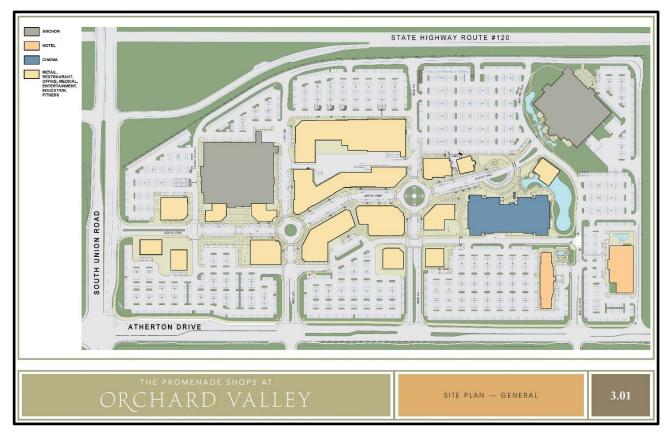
Proposed Revised Planned Development Site Plan Showing Land Uses per Building
